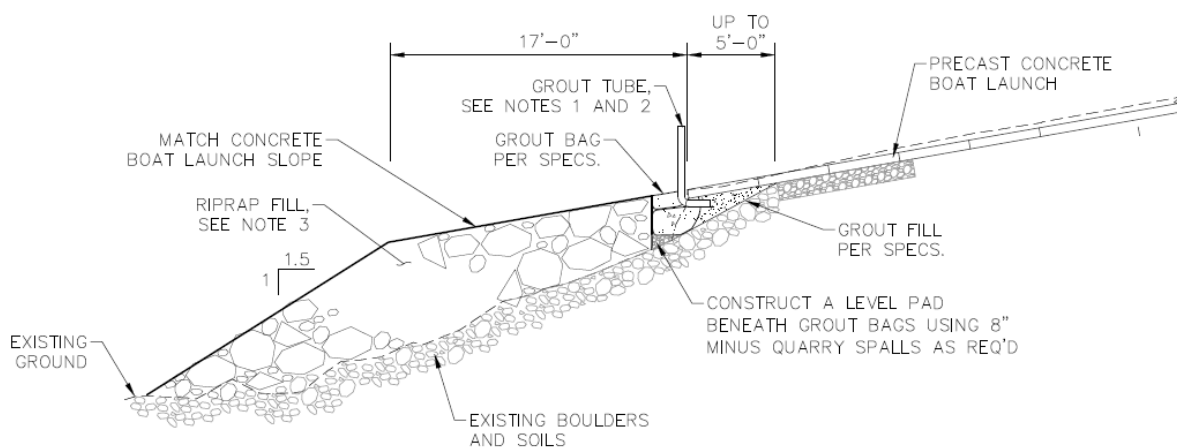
Cross Section of Boat Ramp with Riprap Placement (WWNF 2018).
